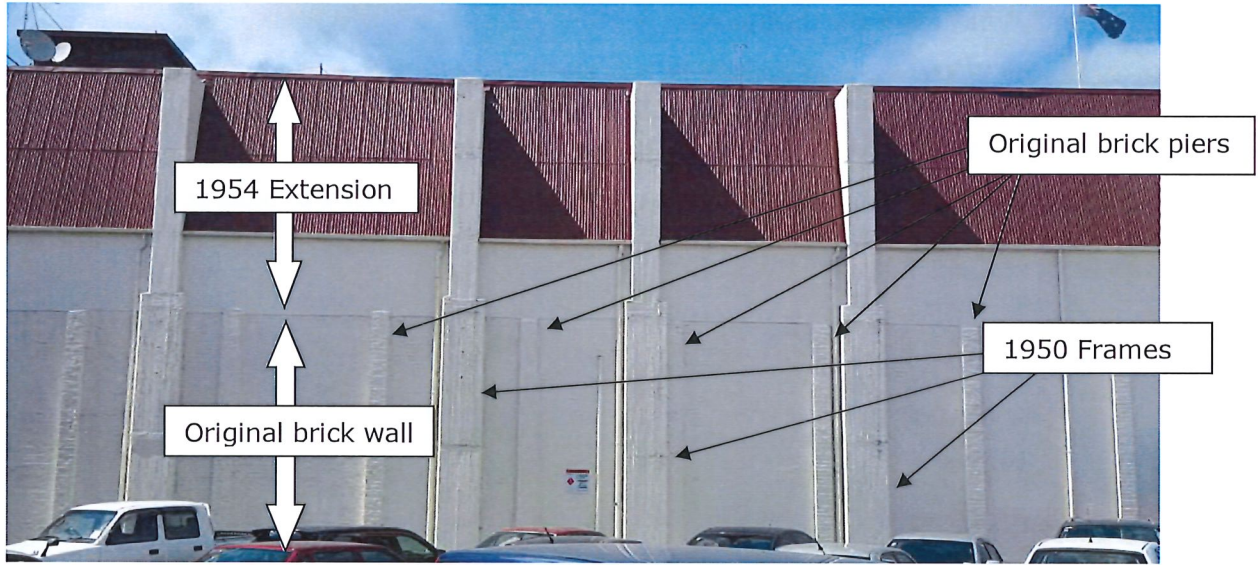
Side wall of Hall – new frames marked, original brick side wall visible
